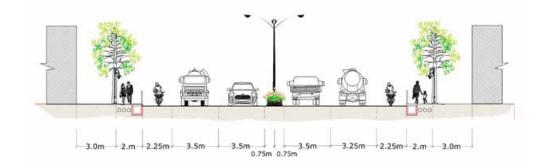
Cross section of proposed four lane roads Source : Sabaragamuwa Provincial Office, UDA, 2020
